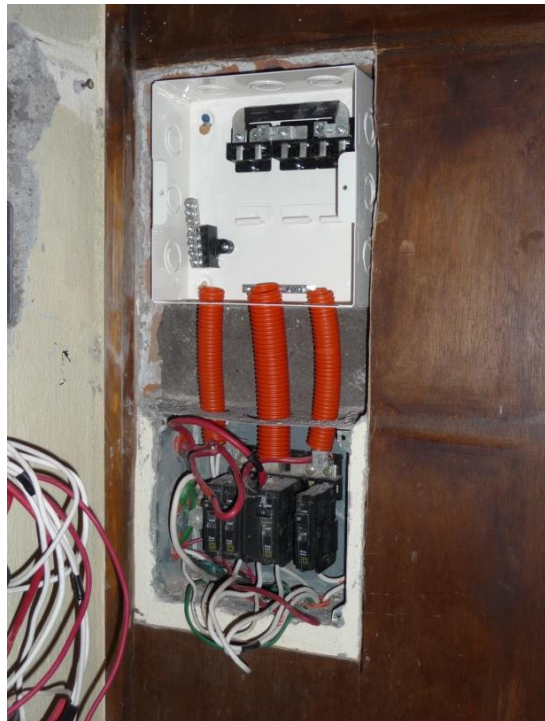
New Appliance Subpanel Installed above Original Kitchen Subpanel
